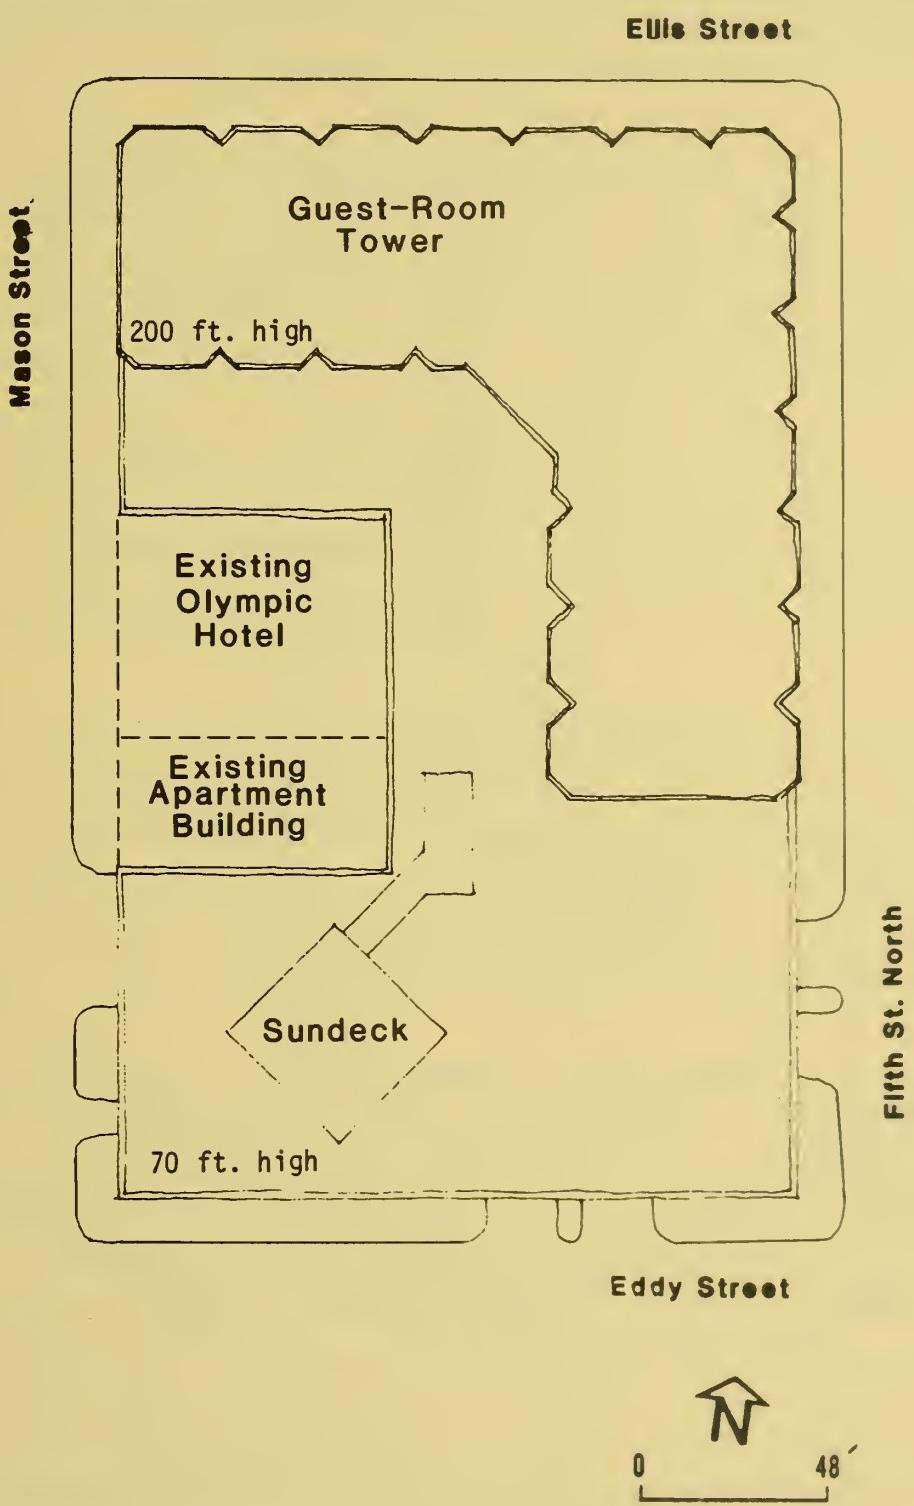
REDUCED HEIGHT ALTERNATIVE - SITE PLAN
